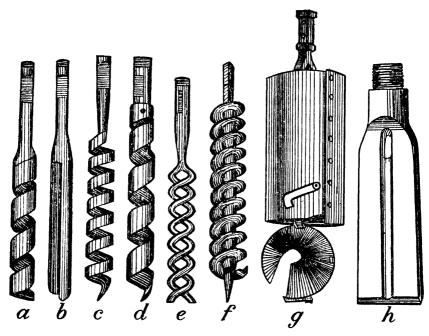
Various earth augers manufactured by R. R. Howell & Co. a, For clay and hard pan; b, for boring and removing core; c and d, for general boring; e, for loosening and removing stones; f, for loose sand soil; g, a drop-bottom, fast-cutting auger especially useful with power-driven machines; h, a spudding, jetting drill used in rock drilling. Blasting is much more rapid for latrine installation in rock.
